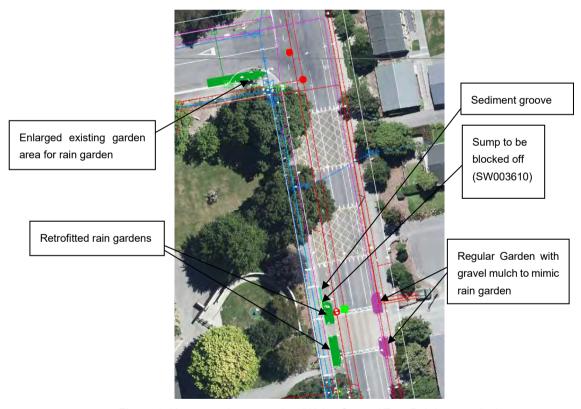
Upper section upgrades (Wales Street / East Belt Intersection)
